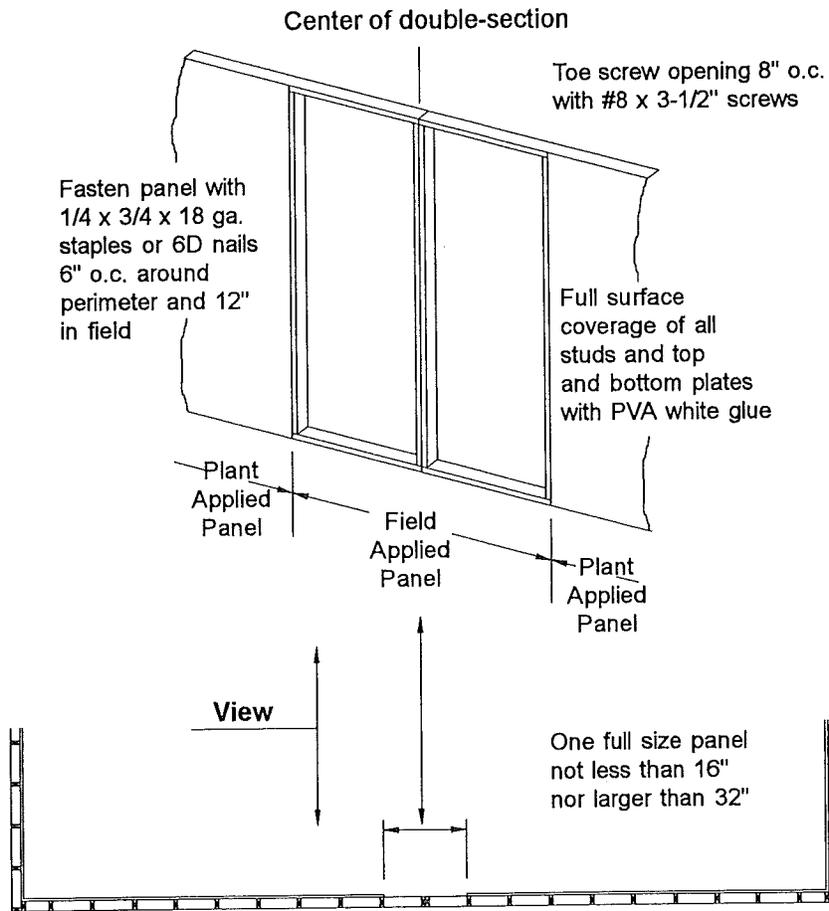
Int. Closure: Marriage Wall and Door Opening Connections
